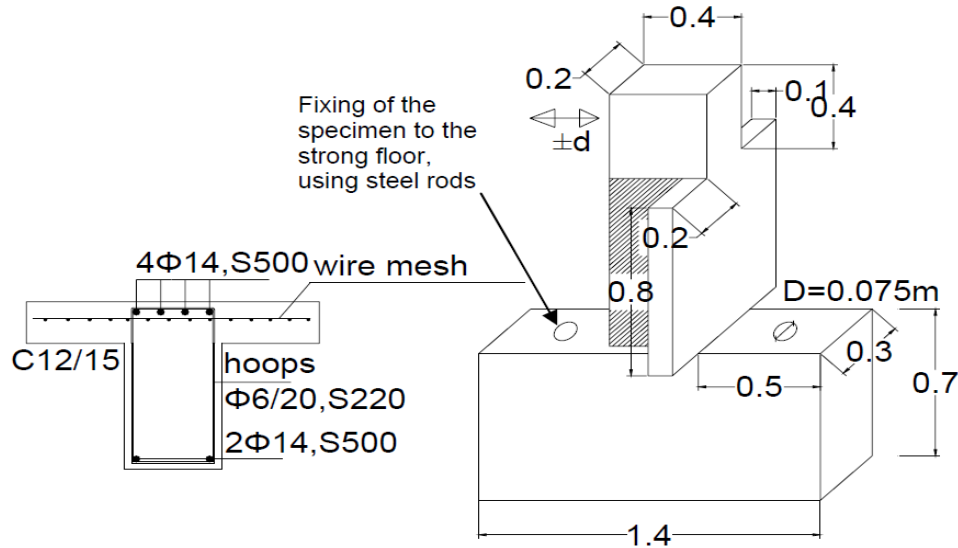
Geometry, reinforcement and (schematic) testing procedure of beams
